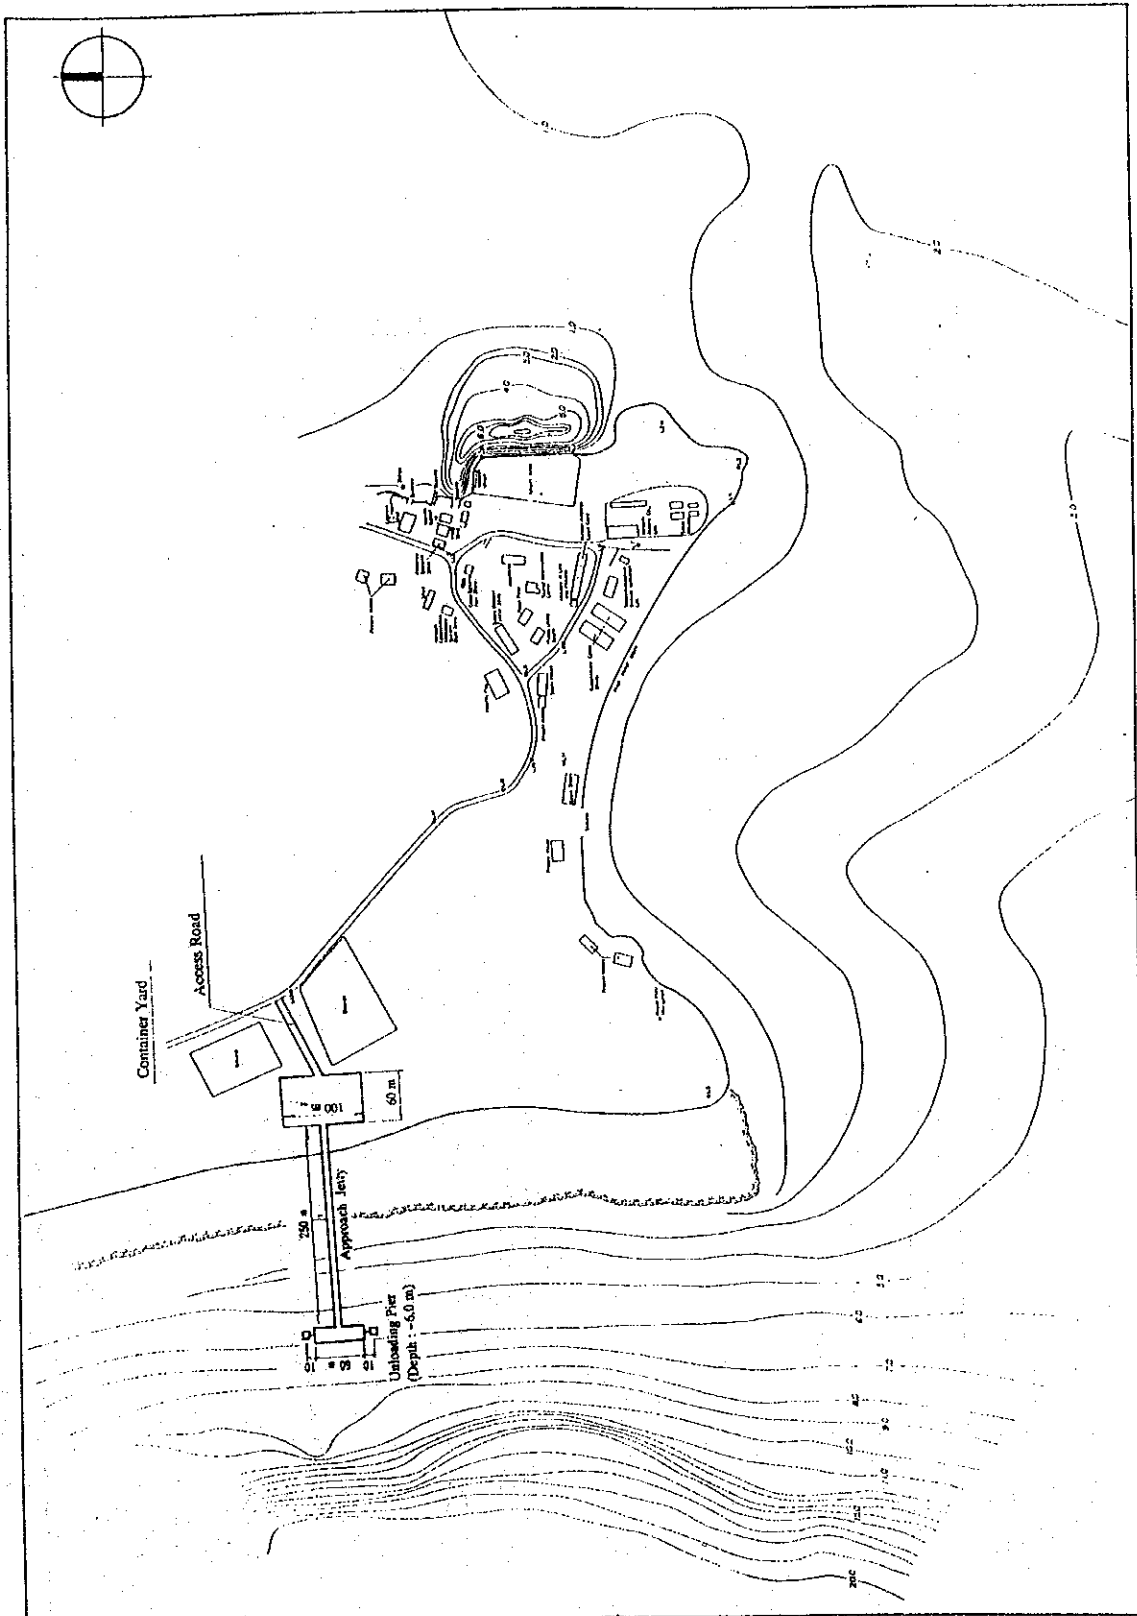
(1) Conceptual Development Plan of London Wharf, Alternative Plan 1
